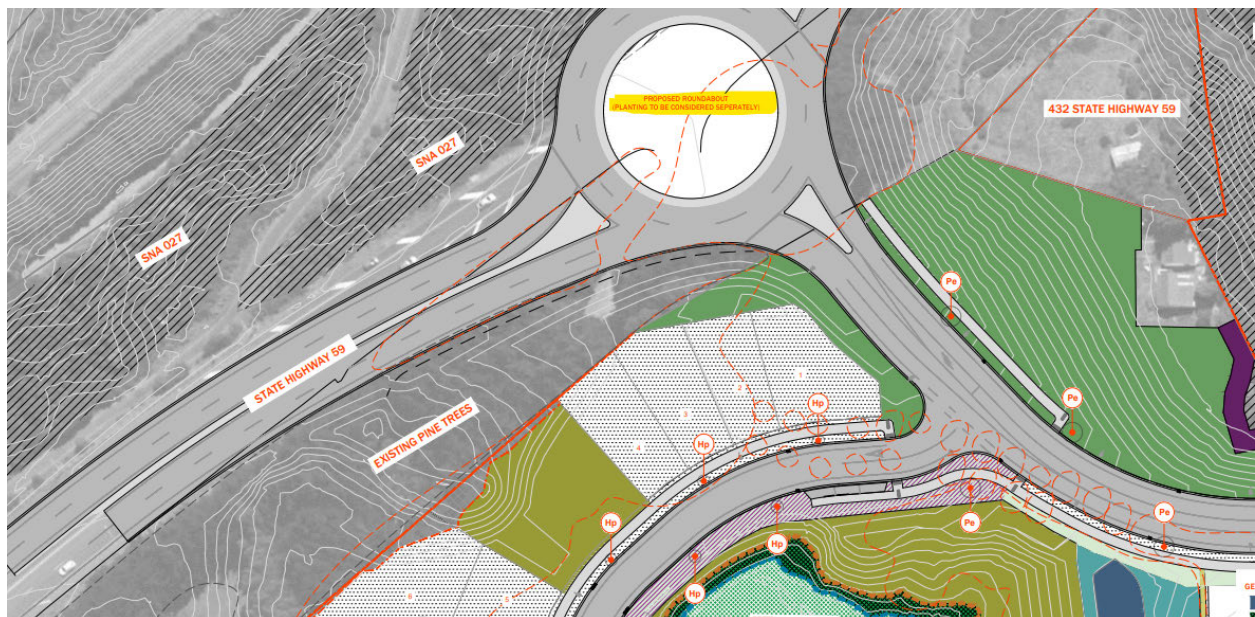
LEP plan showing that the planting proposals do not include the SH59 road reserve (highlight added)
